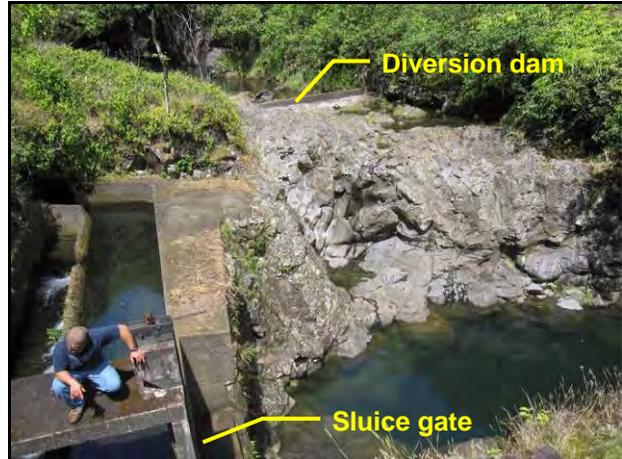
Upstream view of West Wailuaiki Stream with diversion dam on the left bank and and sluice gate/intake structure on the right bank.
